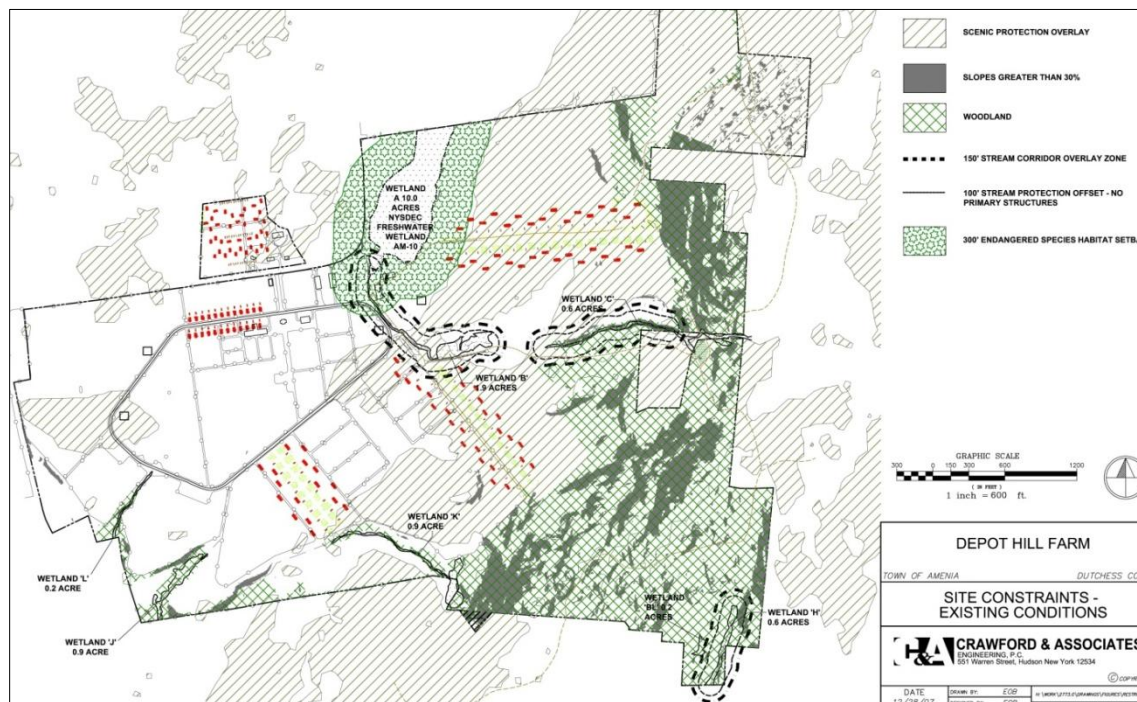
Proposed site plan with the SPO shown as hatched, along with other elements
